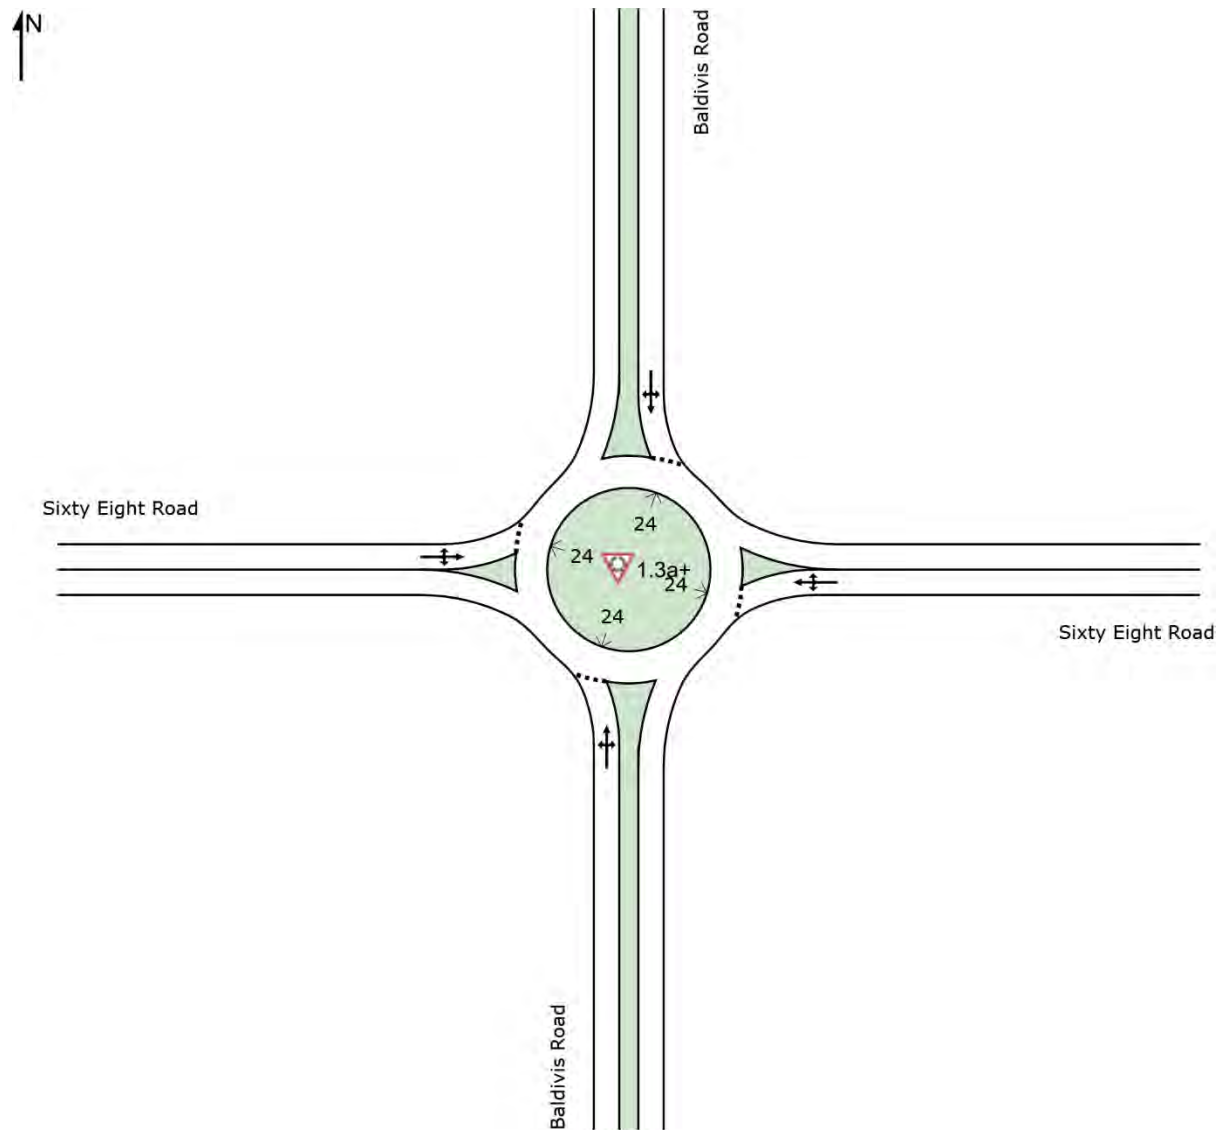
M03 Sixty Eight Road / Baldivis Road – SIDRA Schematic Geometry
